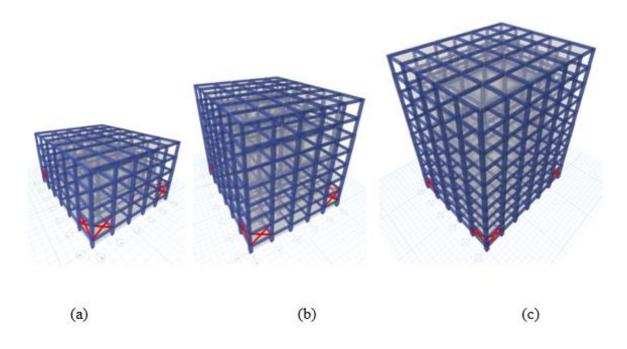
3D view of braced (a) 4, (b) 7, and (c) 10 storey building
